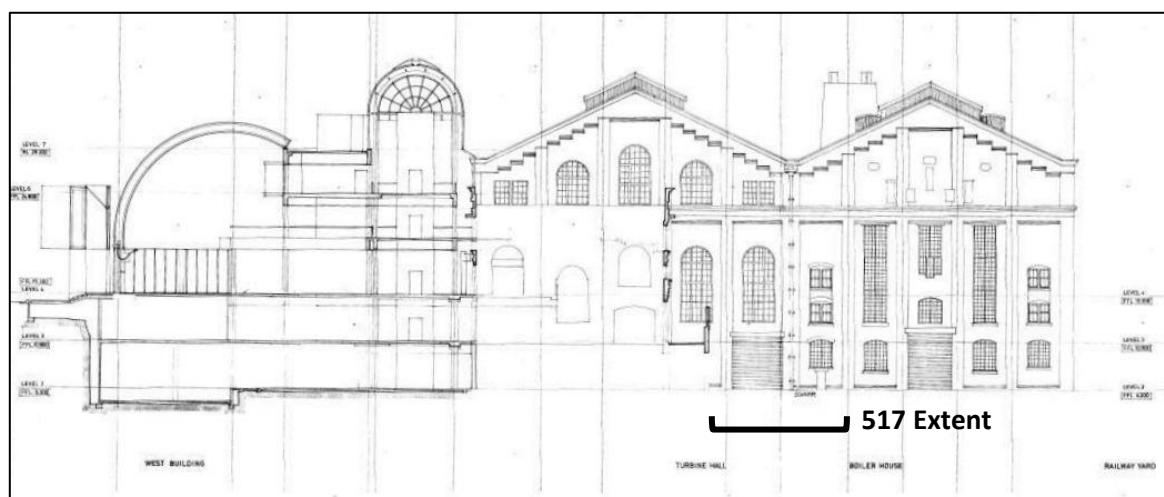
1984 MAAS Stage 2 Construction plan. Section 11 faces South, and illustrates the basements beneath the West Building (the Wran Building), the Turbine Hall and the Boiler House (left to right). The approximate extent of 517 off Harris Street has been marked.
